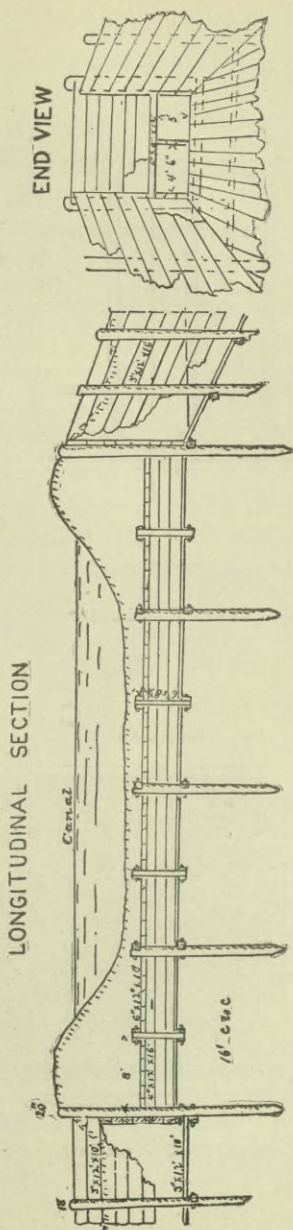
SECTIONS OF WOODEN SIPHON, DEL NORTE CANAL.
